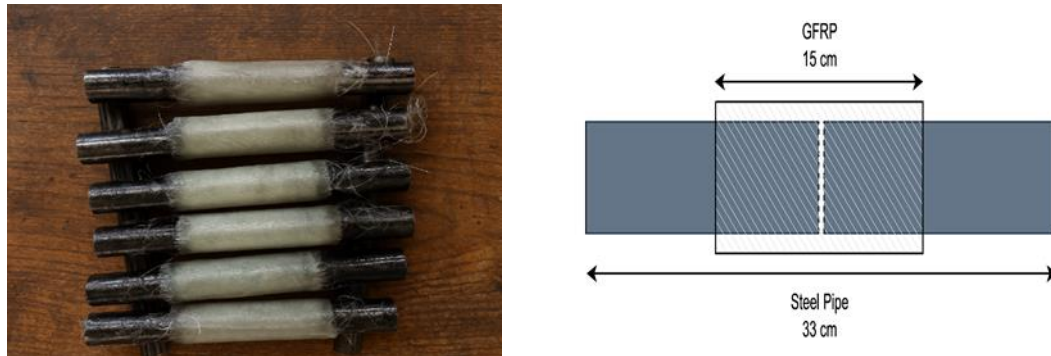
(a) Schematic view of the steel pipe wrapped with GFRP (b) GFRP-wrapped steel pipe specimens
